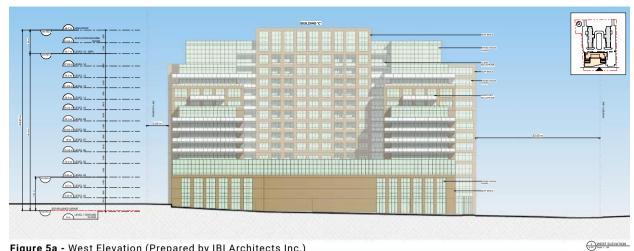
West Elevation (Prepared by IBI Architects Inc.)
